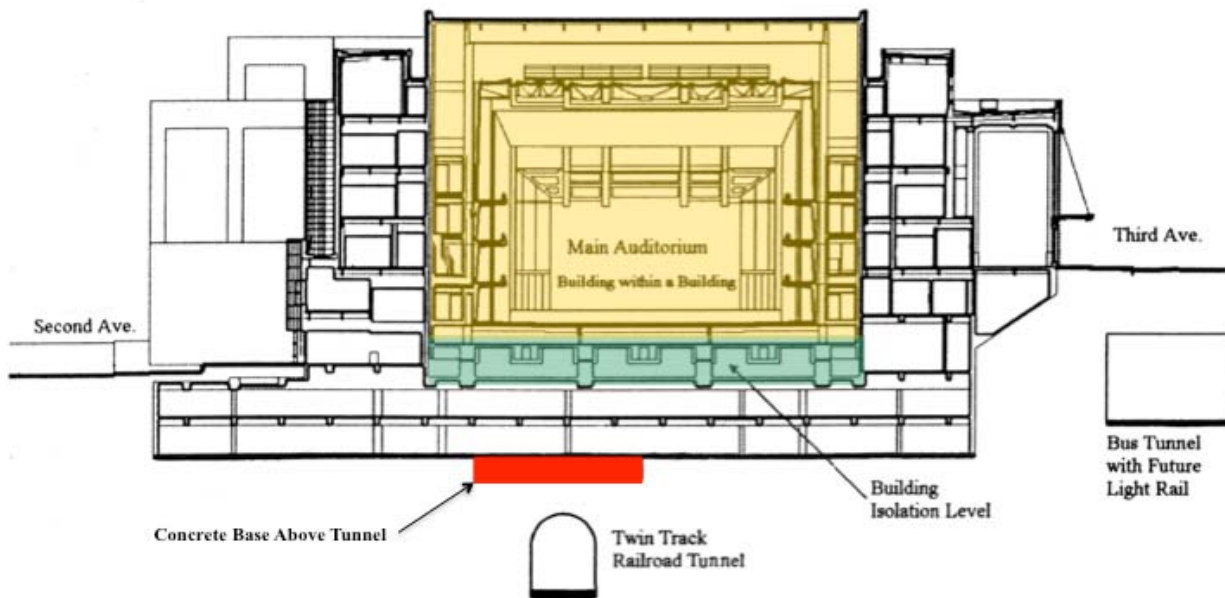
Cross-section of Benaroya Hall showing the isolation system elements and the Isolated box-in-box concert hall within the city block size building
